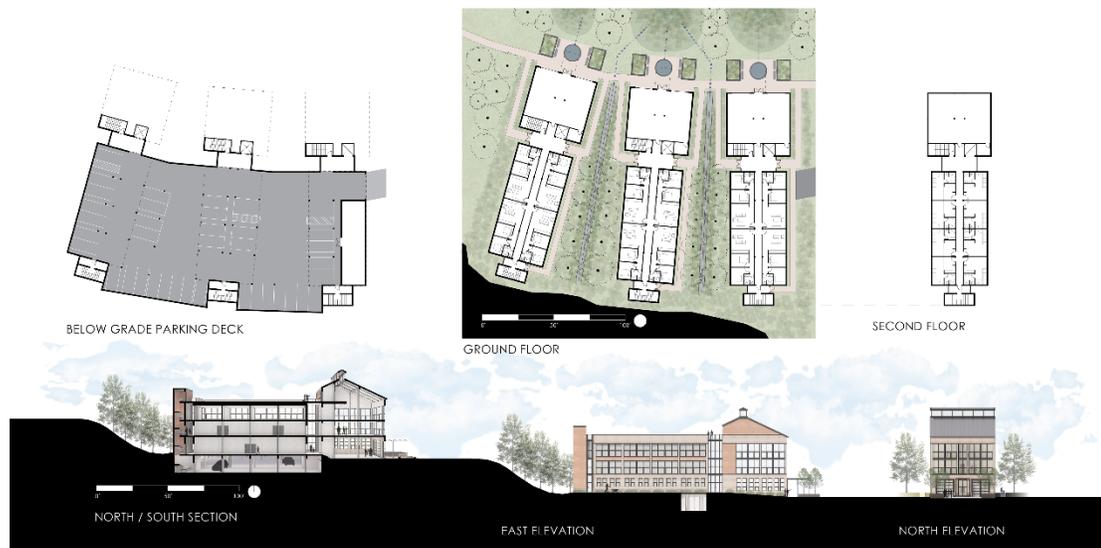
Plans, sections, and elevations showing the design of the new live/work buildings (Graphic created by Author).
